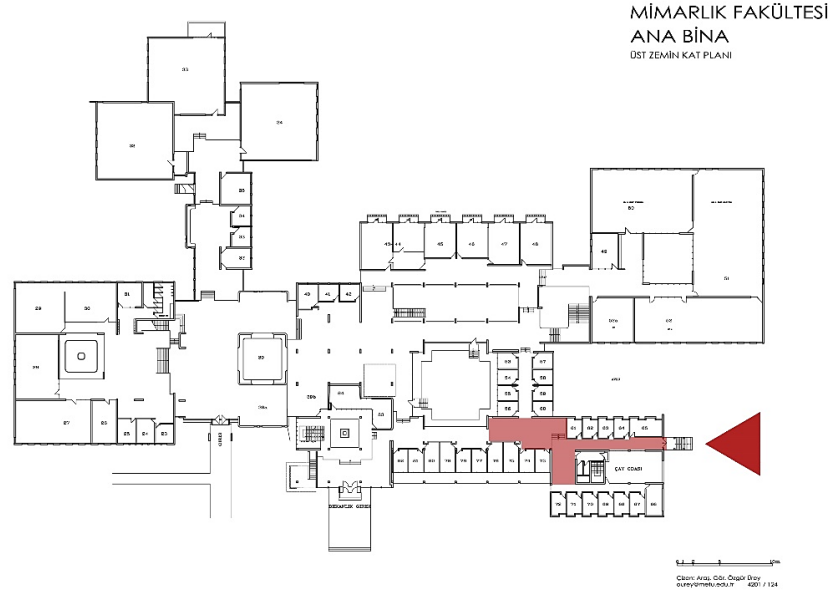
Upper Ground Floor Plan of the METU FA (plan drawn by Özgür Ürey).
